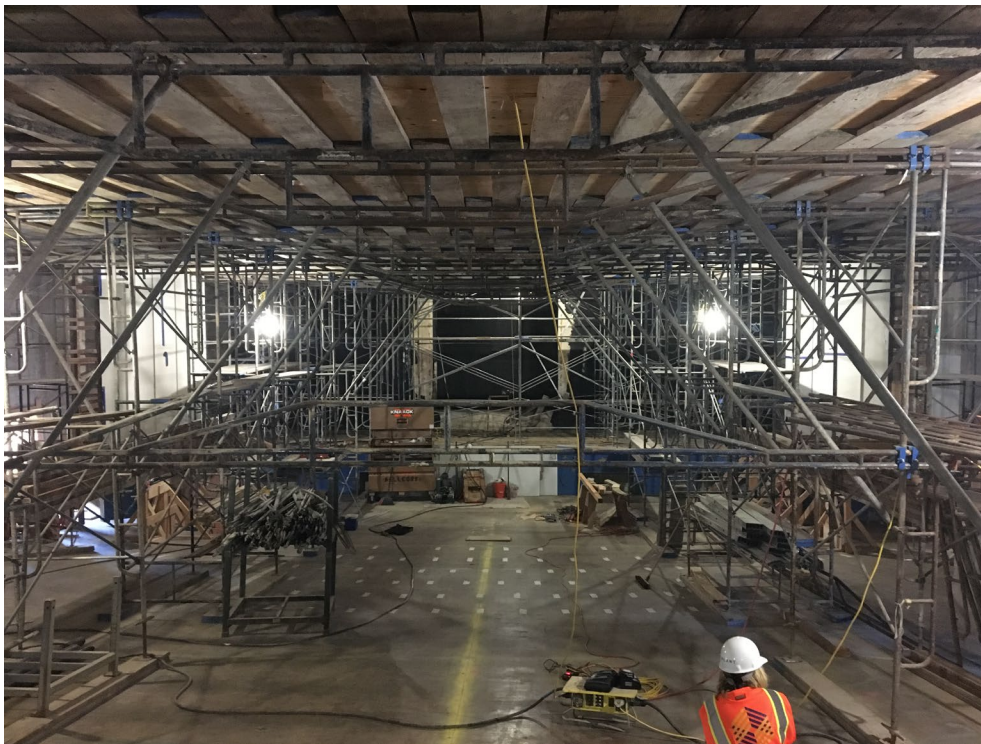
Theatre auditorium under construction (Presidio Trust, 2018)
